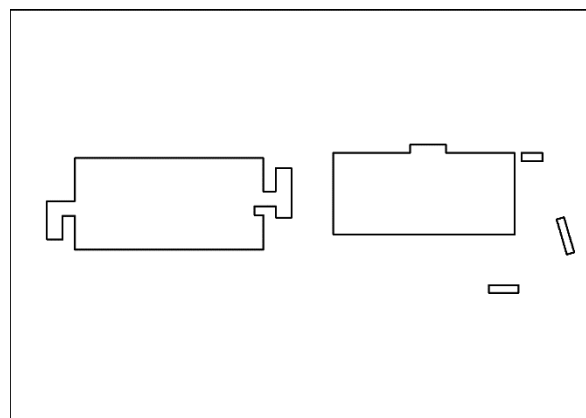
Example of a floor plan of a Brazilian Youth Prison - Form C
